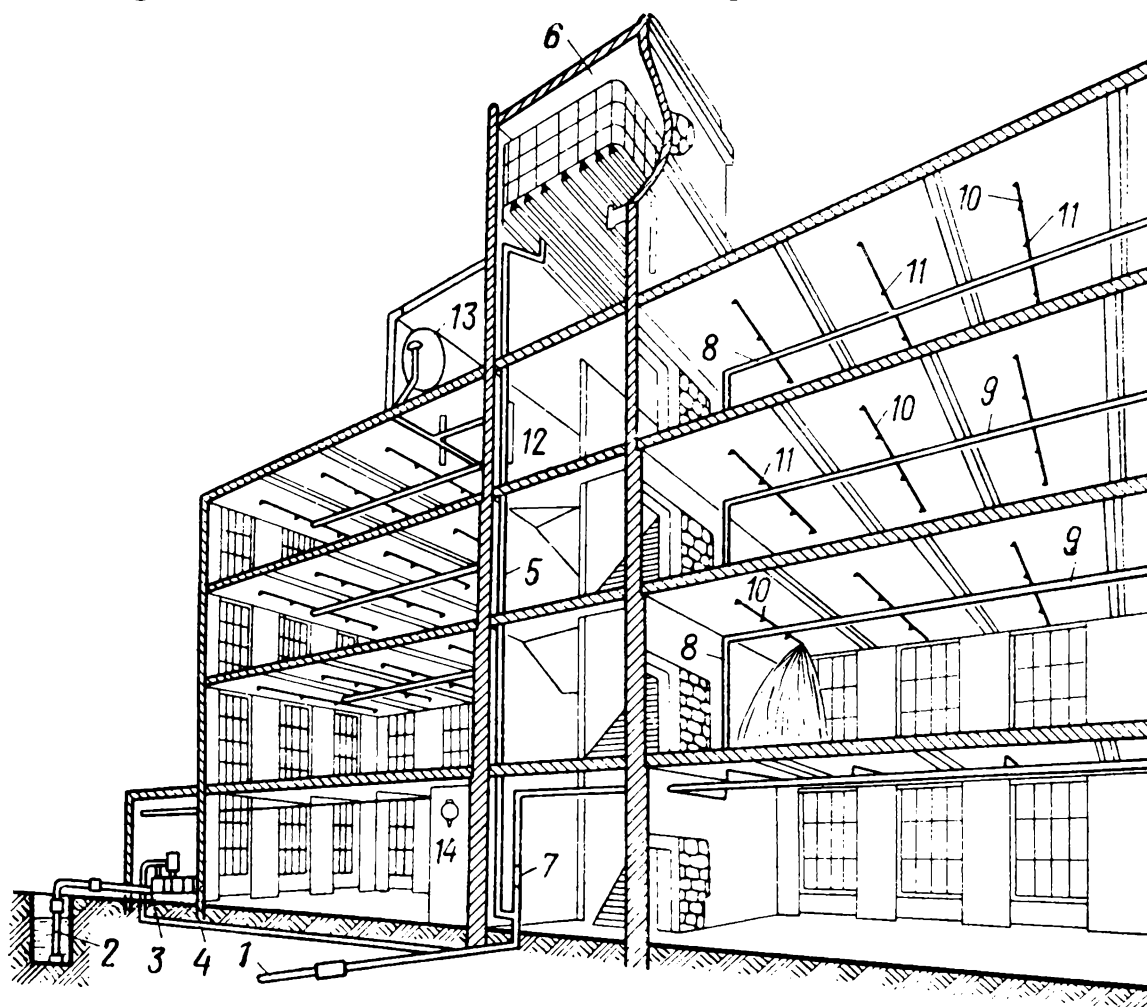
General outlines of a sprinkler installation in an industrial-type building
